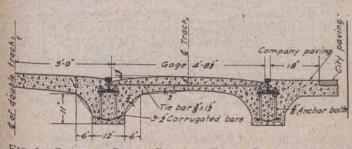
CONCRETE STREET RAILWAY TRACK CONSTRUCTION AT ANDERSON, N.C.
